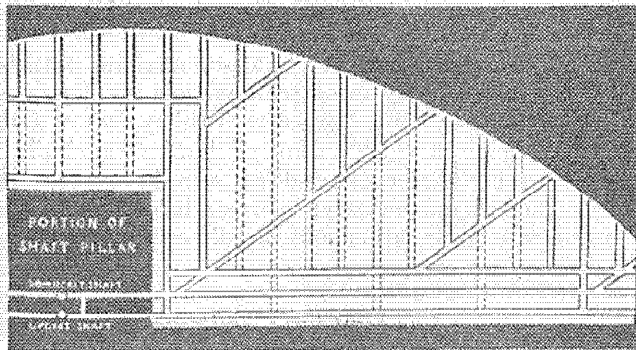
Opening out a 4-foot seam by advancing the longwall
